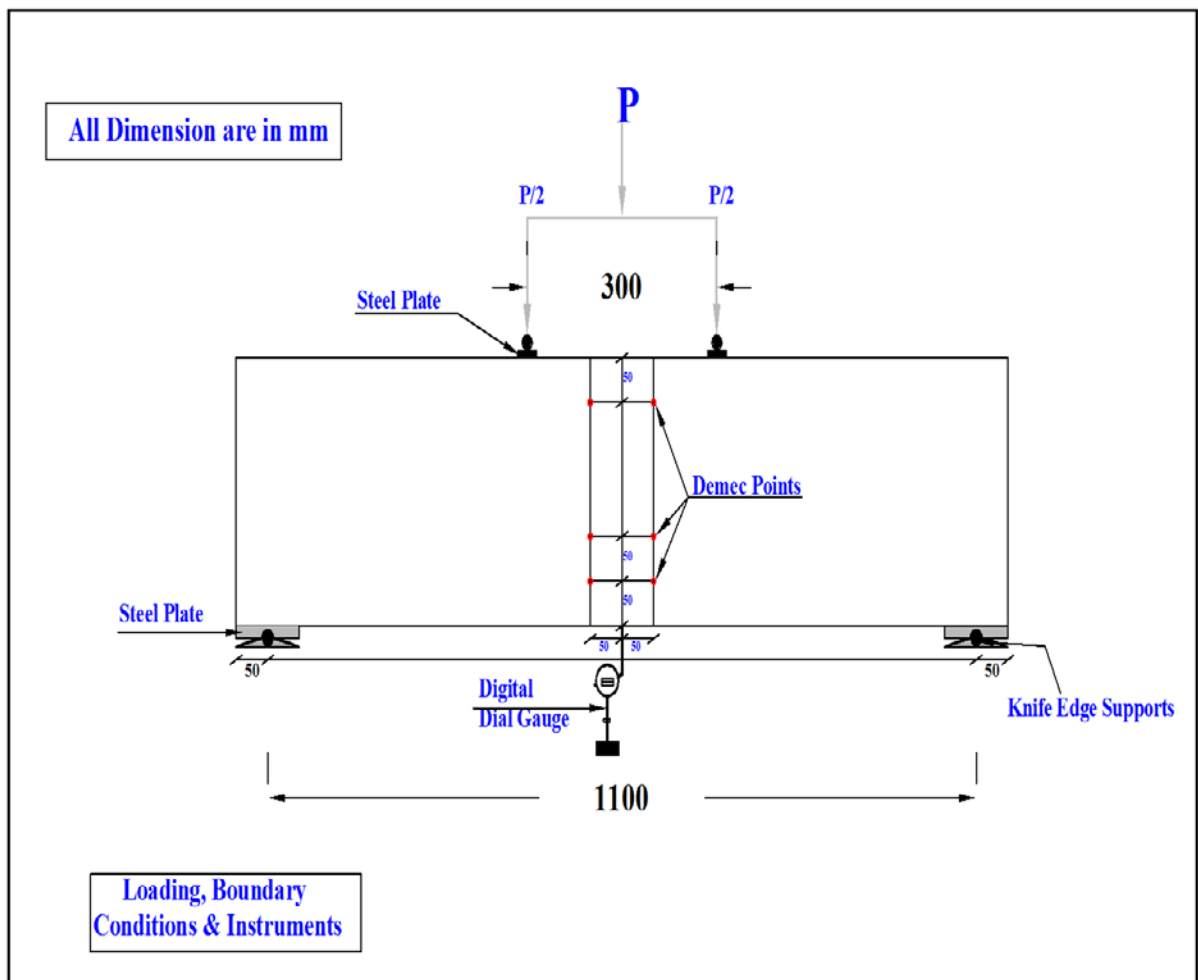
Arrangement Specimens of Two-Point Loading and Instrumentation.
